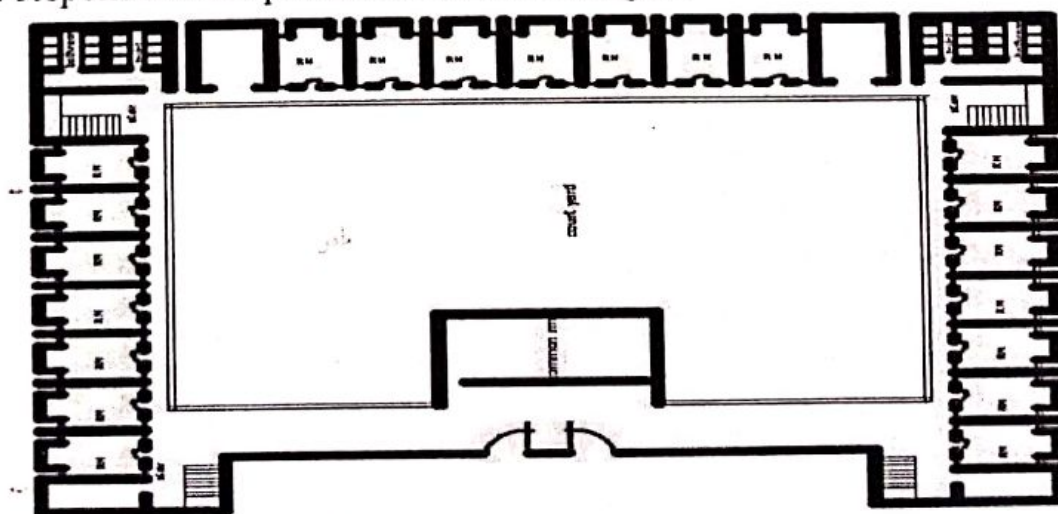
Ground Floor Plan of Male Hostel F.U.T Minna Gidan Kwano Campus.
